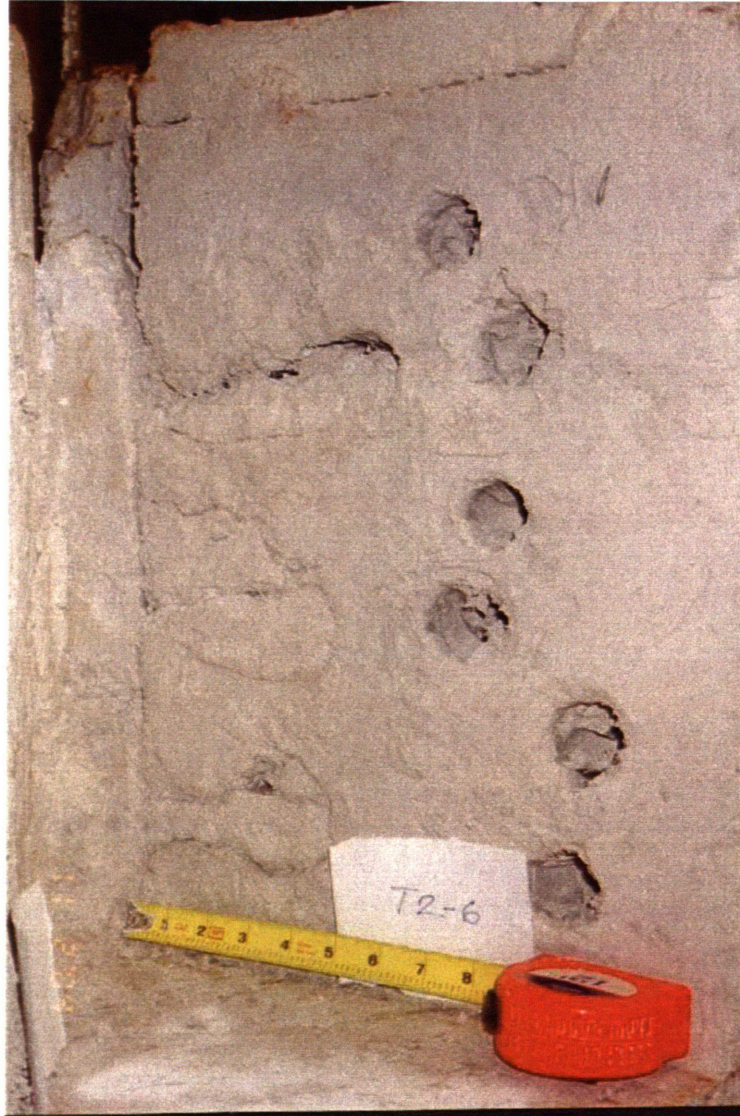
(b). View of exposed vertical soil face (Specimen T2, Section 6)
